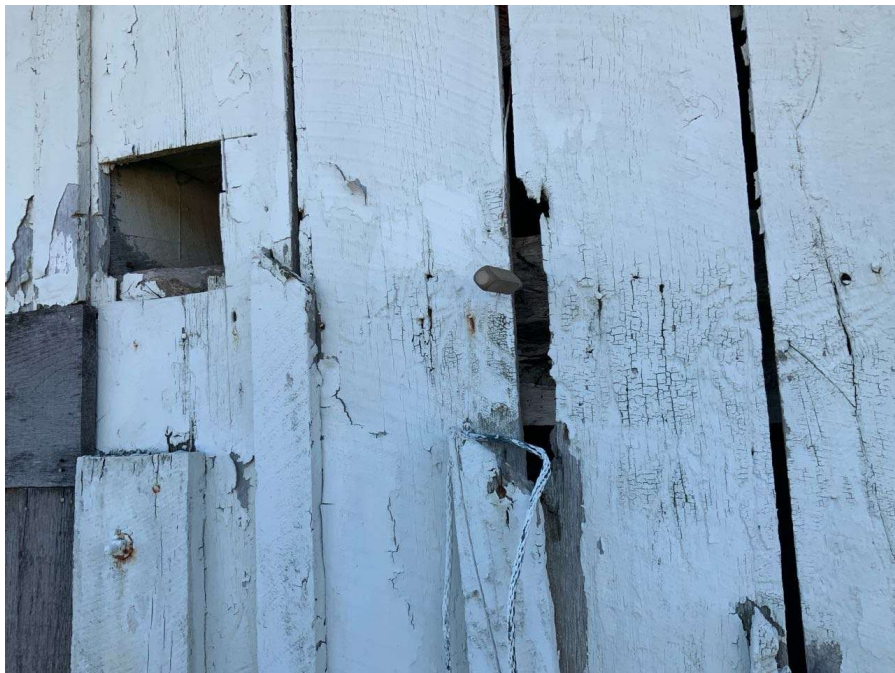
Rot with 2" icepick penetration at east end of floor beam between Column J/1 and K/1 (looking south from exterior).
